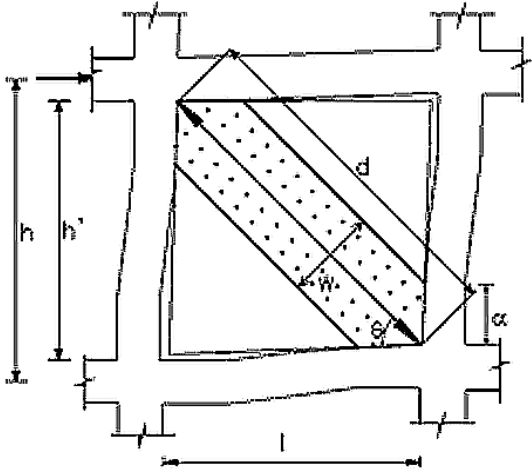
The “Equivalent Diagonal Strut” of a masonry infill wall in an RC frame (Erberik & Elnashai 2003).
